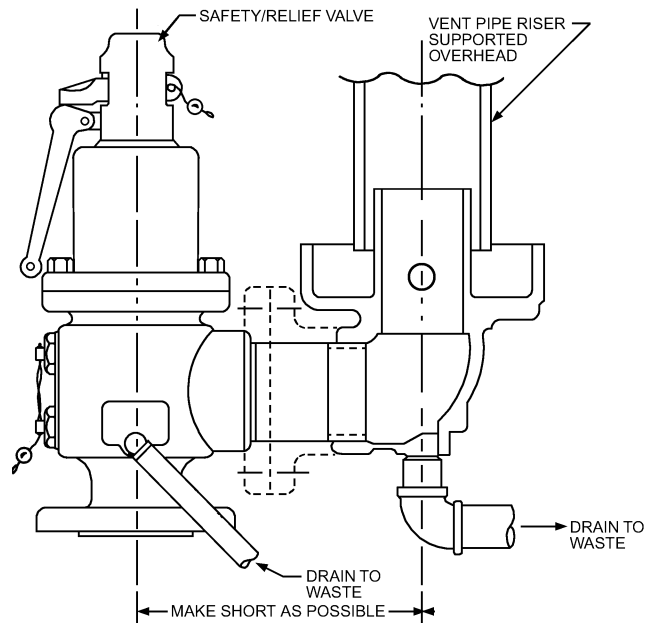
Safety/Relief Valve with Drip-Pan Elbow
